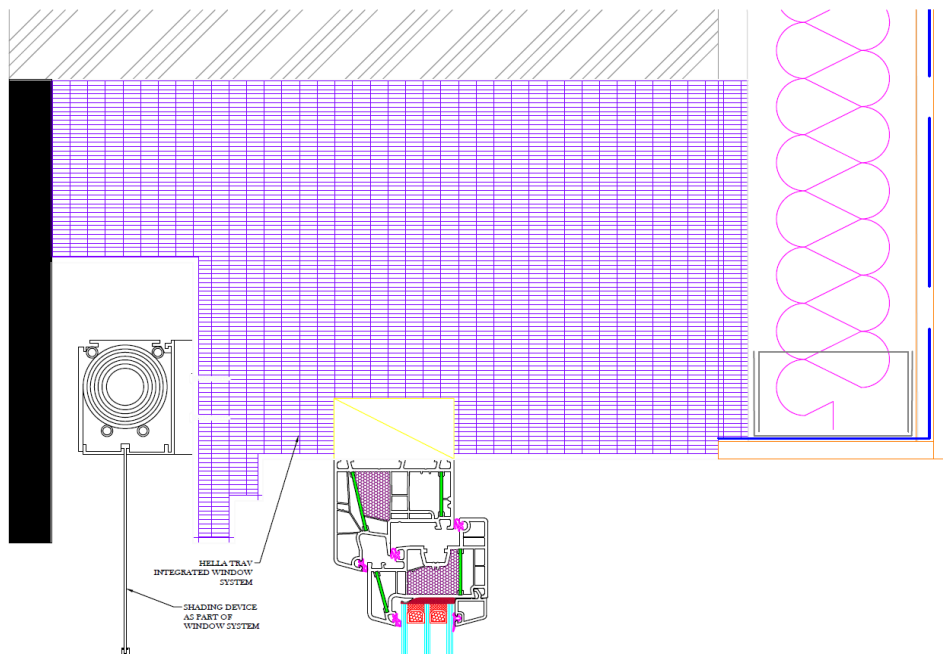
Building 12 Schematic Drawing 2-Upper Window Section
